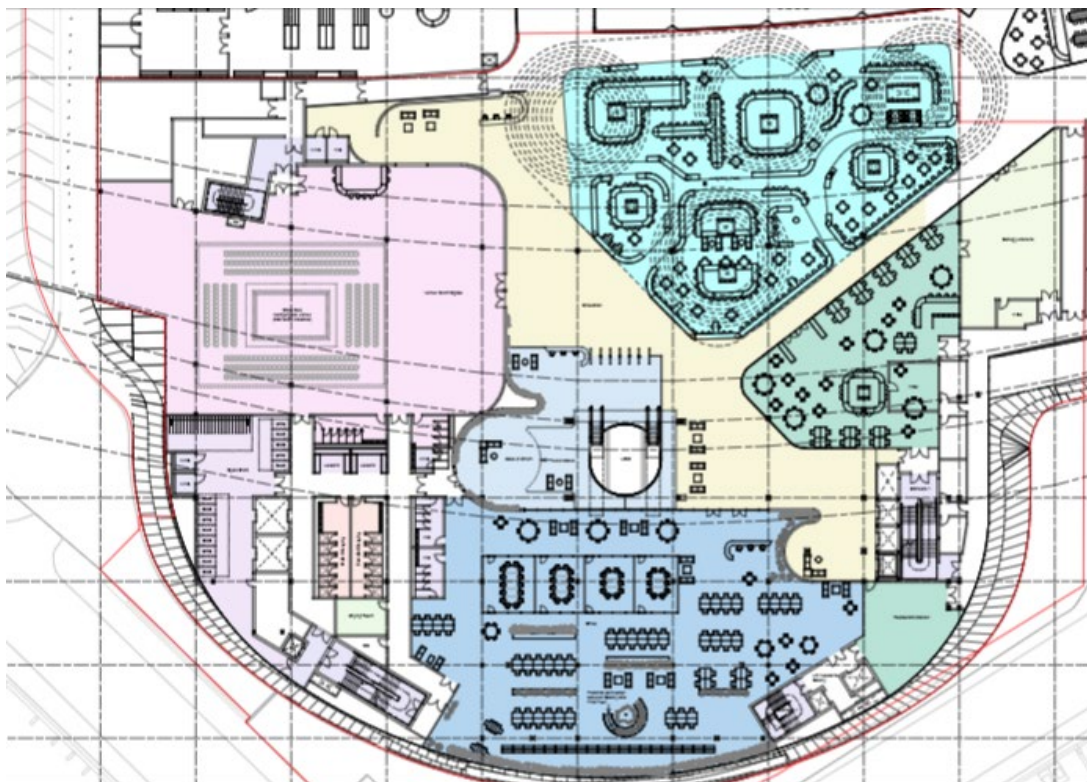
Proposed Gallery Level- Blue indicates restricted access office space, purple is flexible event space, green is publicly accessible food and beverage.
